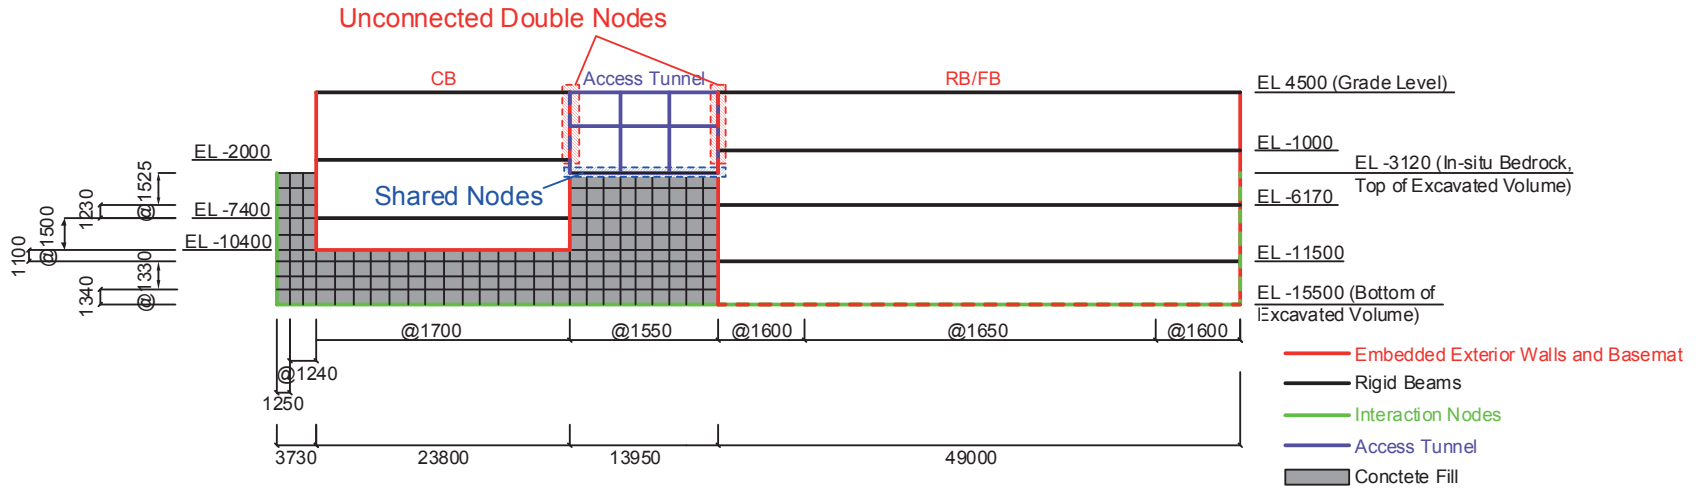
(f) Elevation C-C' Excavated Volume Model (FE)
